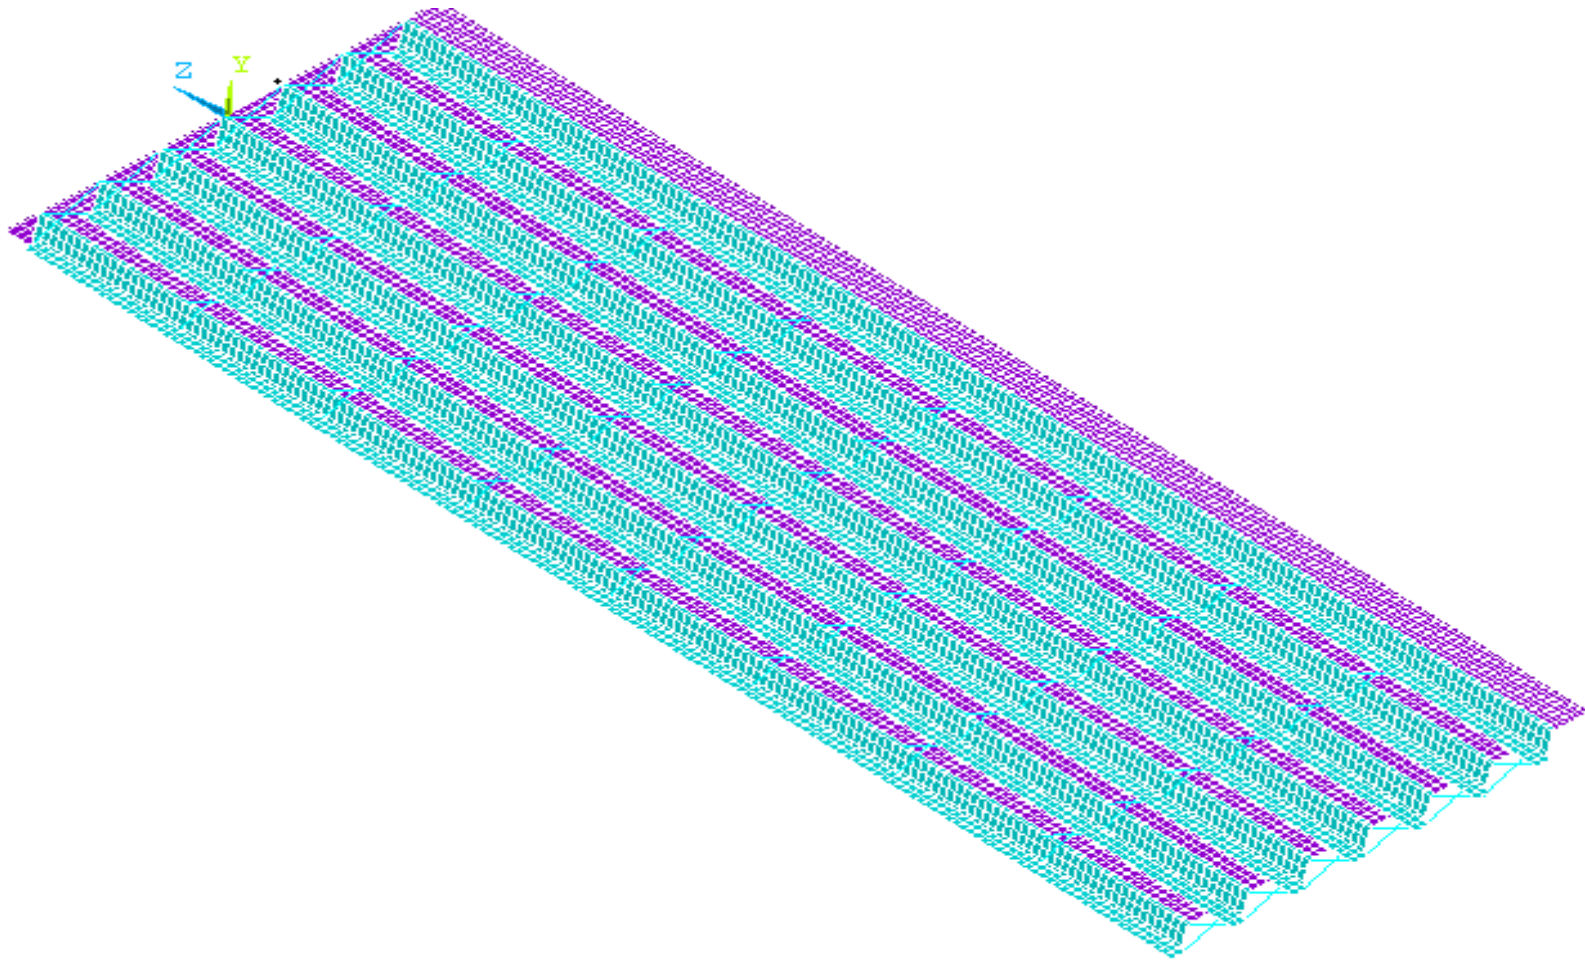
Finite element model for 40 m span with 7 girders at 2.25m spacing
